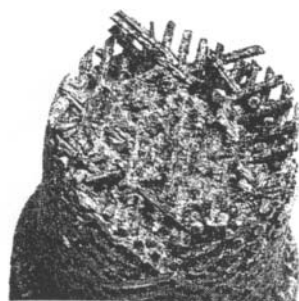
Failure surface of a circular cylindrical specimen with a section diameter of 50mm (S.E.P.)
